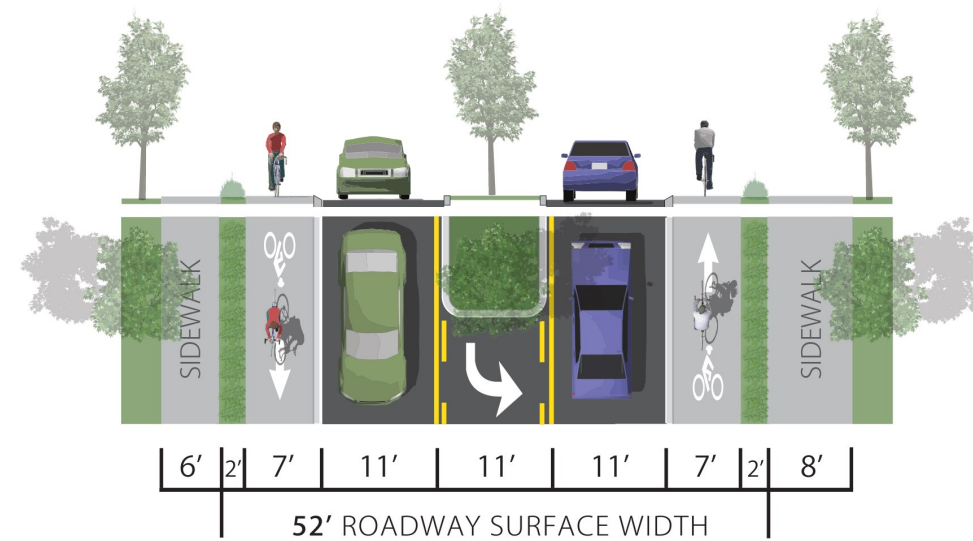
3rd Street Cross-Section | CSAS, Proposed-Raised Cycle Track
